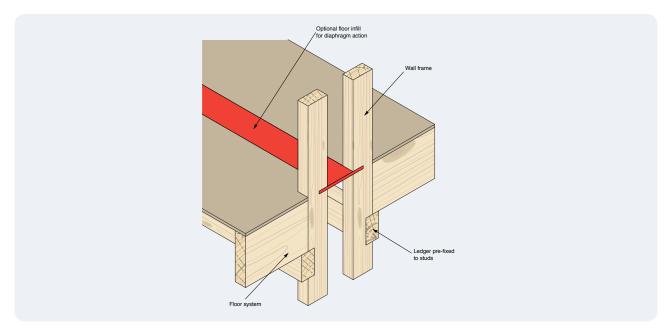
Platform floor frame with discontinuous double stud wall.
